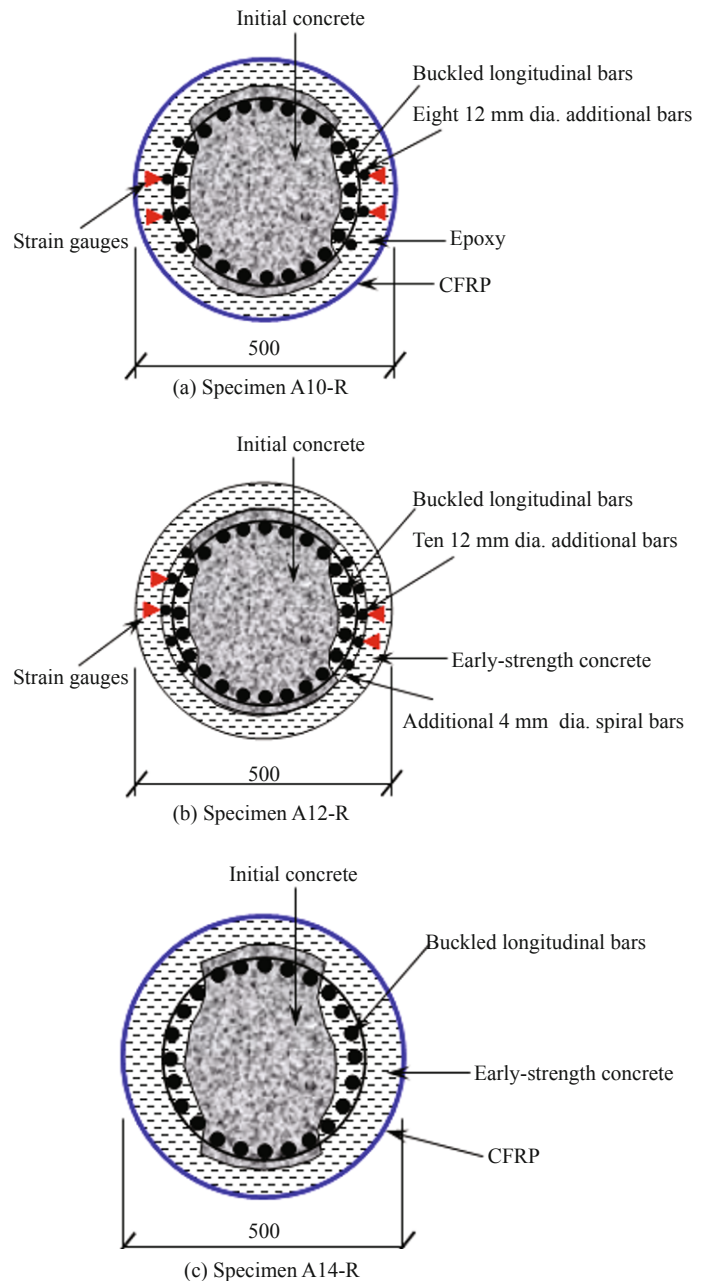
Repair techniques for the damaged pier specimens
